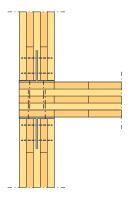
Joint between wall panels and floor slab using slotted-in steel plates.
